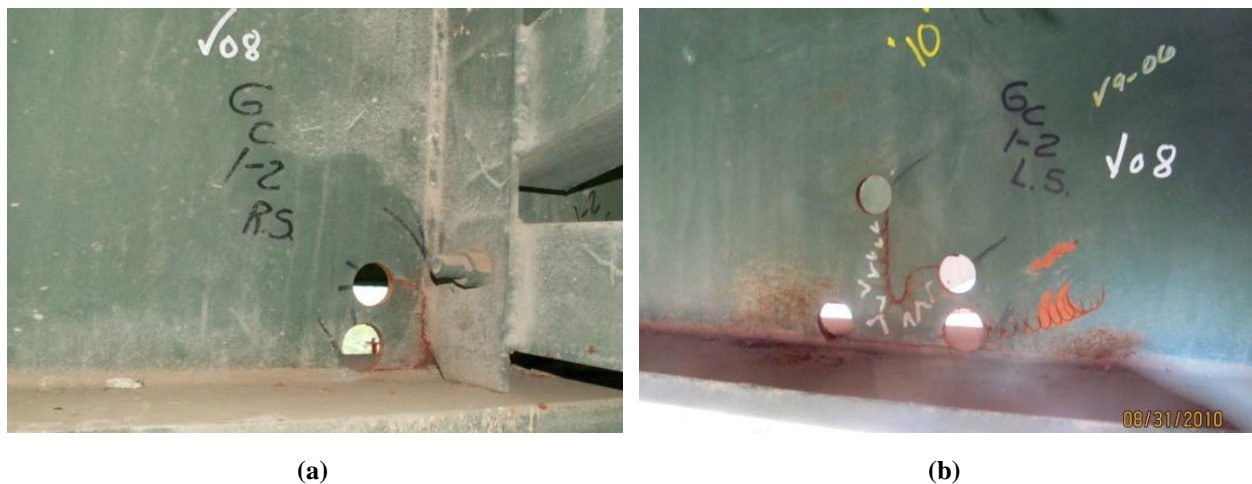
Cracking at the instrumentation location on the (a) stiffener side (b) non-stiffener side.
